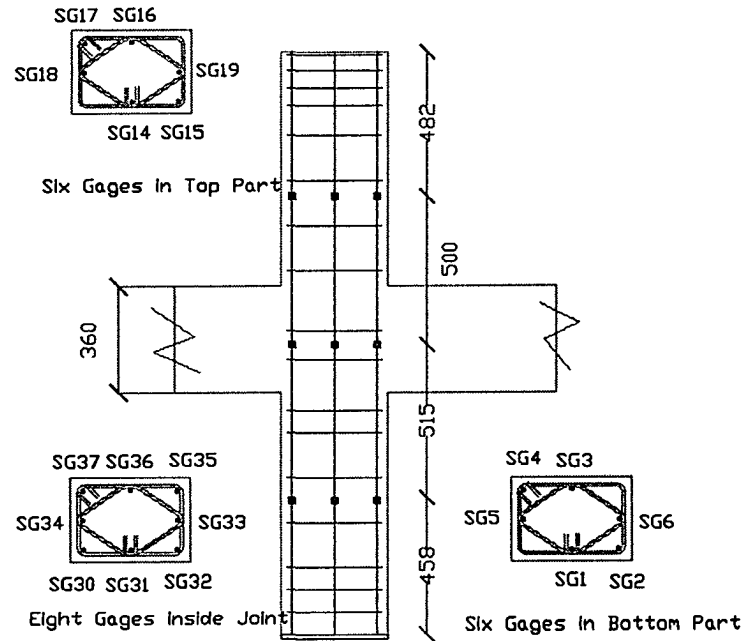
Location of Strain Gages on Column Vertical Rebars (Group B)
